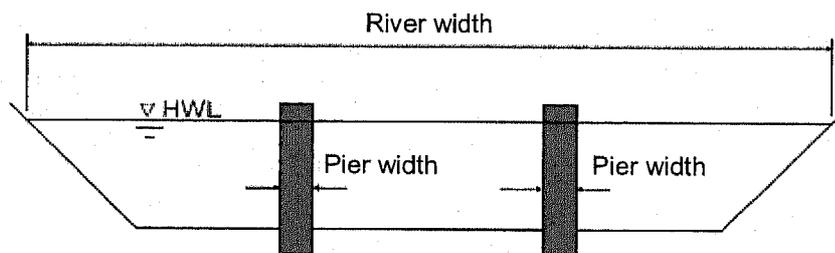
Conceptual drawings of a river width and a pier width
